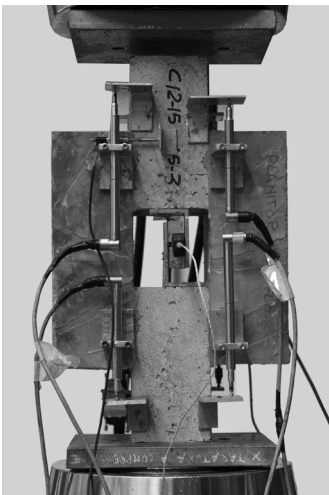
Specimen set-up in the INSTRON Testing Machine.
